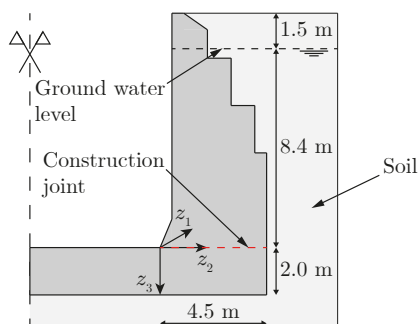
Half cross section of a ship lock chamber with construction joint between base slab and chamber wall.
